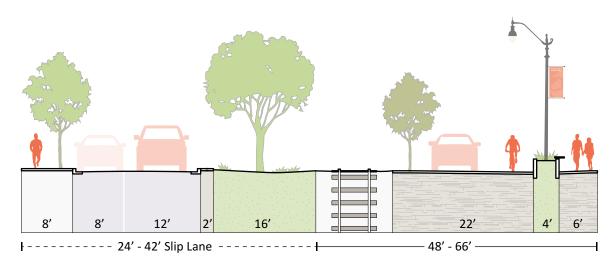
B (1). Hydraulic Street (Long-term).
